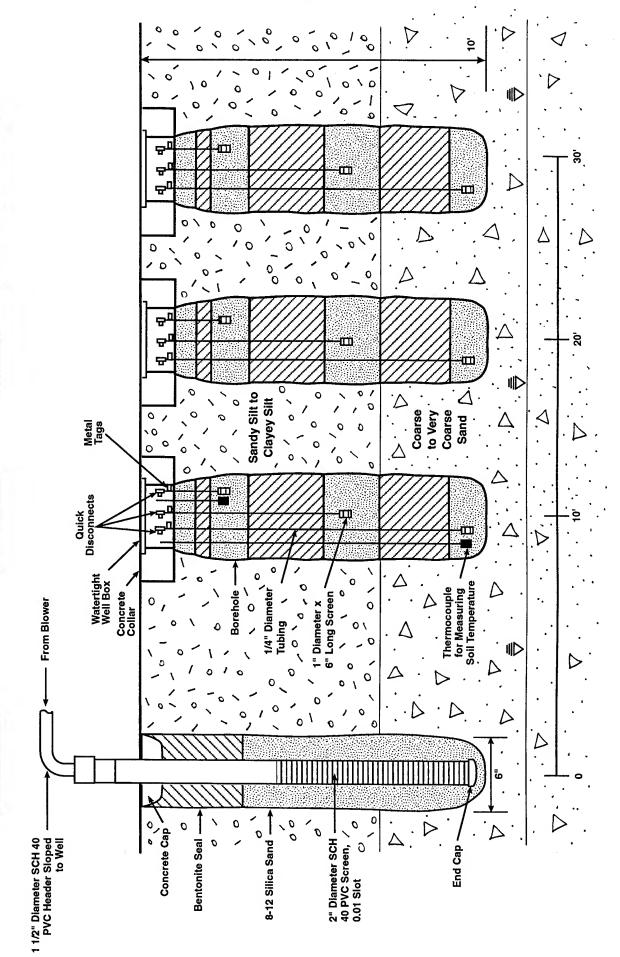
Cross Section of Vent Well and Monitoring Points at the North Storage Tank Farm Showing Site Lithology and Construction Detail (not to scale)
